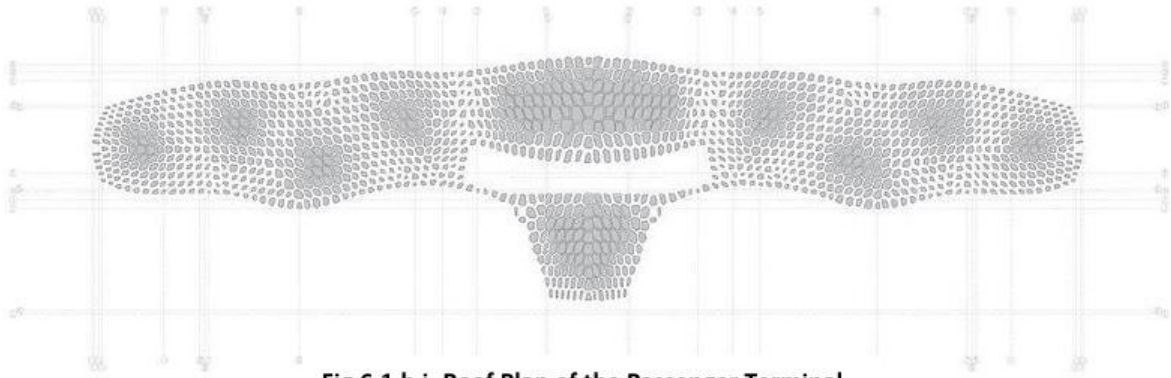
b.i. Roof Plan of the Passenger Terminal
